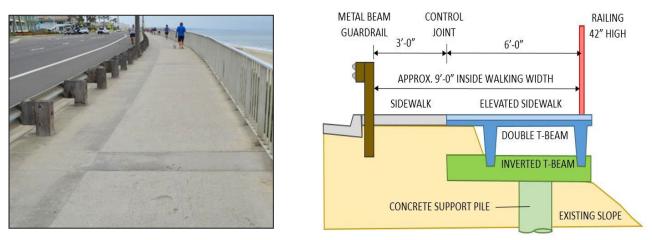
Existing Upper Sidewalk - Pine Avenue to Maple Avenue
